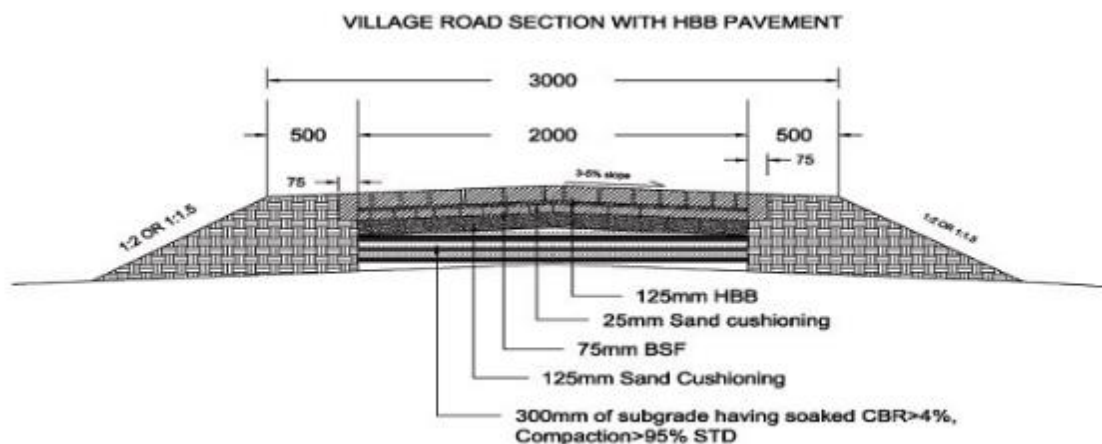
Example cross-section drawing of HBB road design (width 2m)
